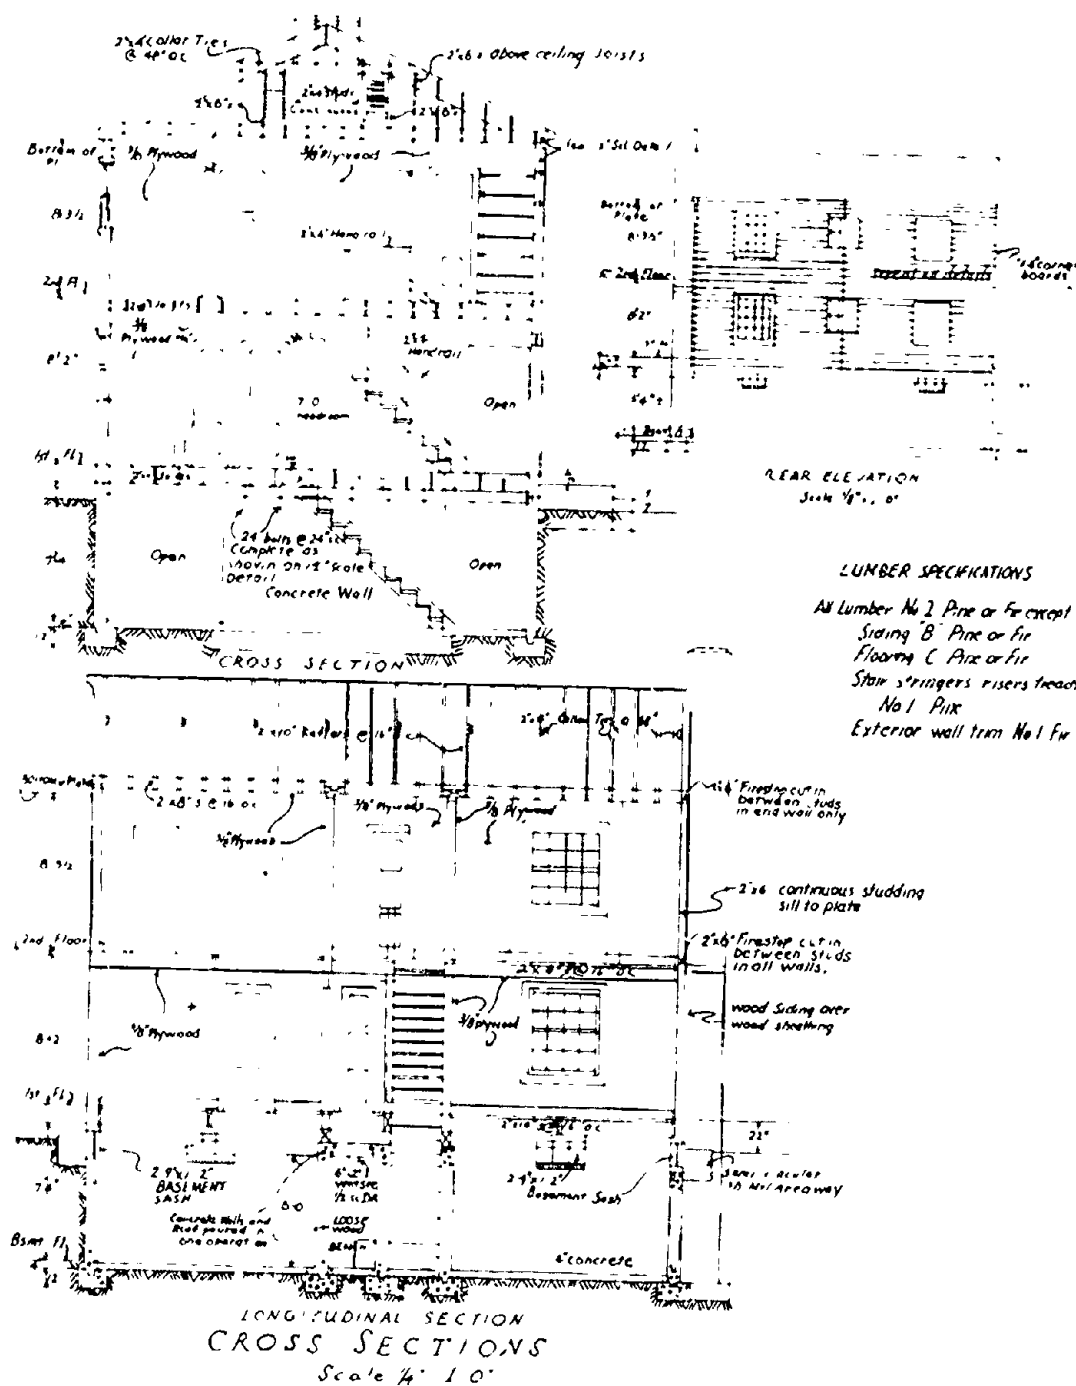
Construction Drawing, Type I House (strengthened version)
